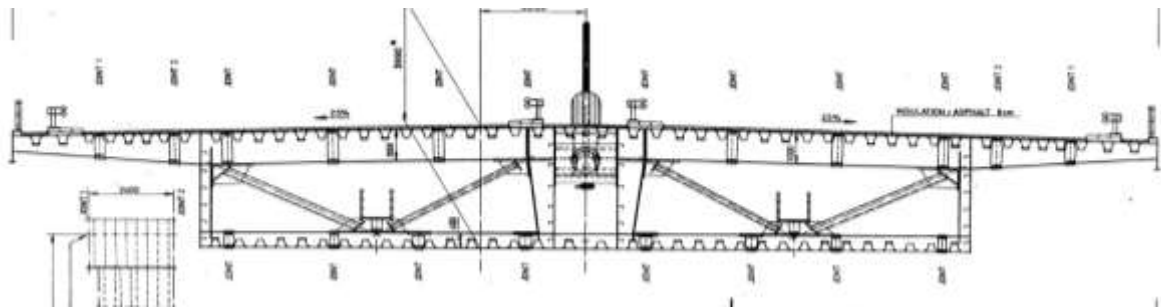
Cross-Sectional View of the Side Sections of the Rama IX Bridge
